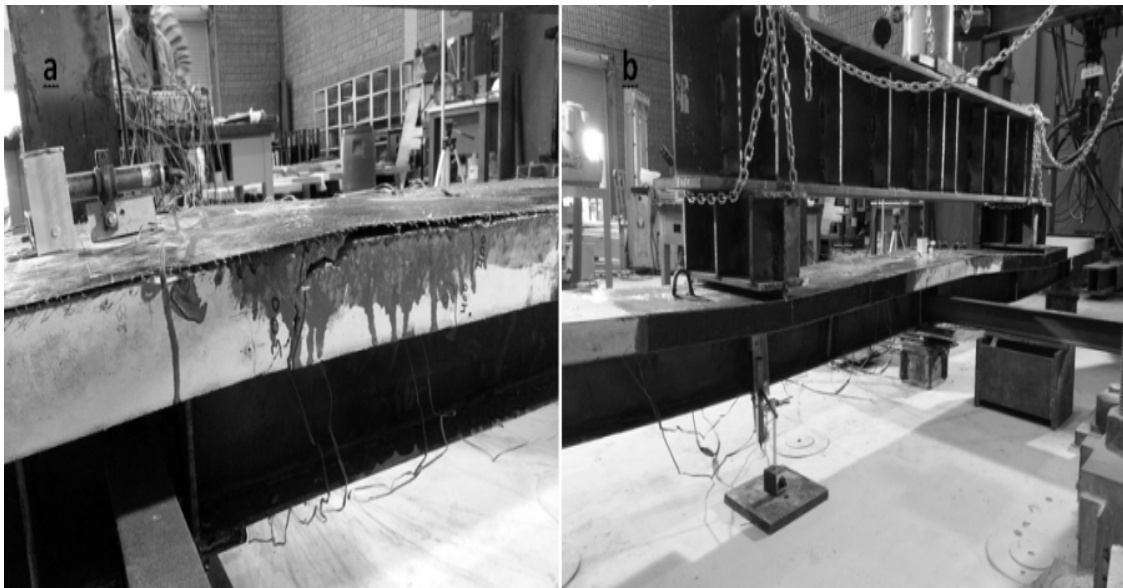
Girder GR0.0 CFRP debonding at failure
